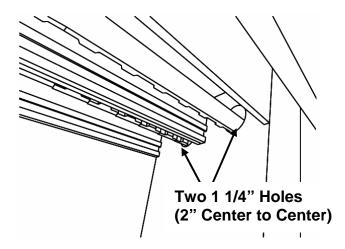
Drive Belt Path Holes for <u>Outside Door Pocket Installation of Idler</u> <u>Pulley for One Way Door</u> <u>Idler Pulley Belt Path Clearance for Bi-part Door (One Head Track</u> <u>Channel for Belt Path)</u> – For bi-part doors using a single head track channel for the belt path, it will be necessary to cut a "window" centered on the head track channel that is 1 1/2" wide by 1" high (See Figure 22). Cutting the "window" needs to be done before installing the idler pulley; <u>however, to ensure proper location of the</u> <u>"window", first read the rest of these instructions</u>.
